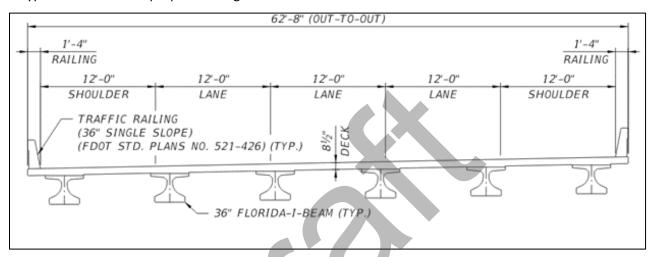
Typical Section of Proposed C-D Road Bridge over Cypress Creek
